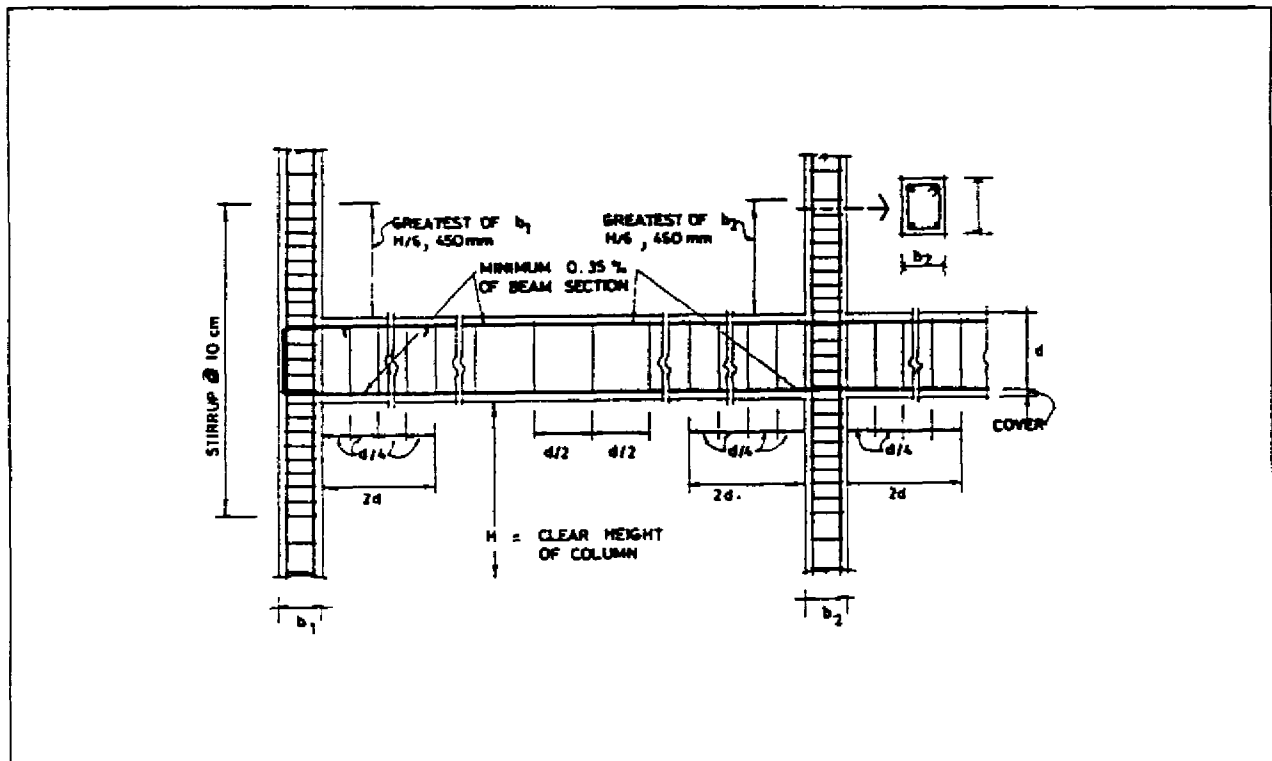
Details of Reinforcement in Reinforced Concrete Construction [1]
